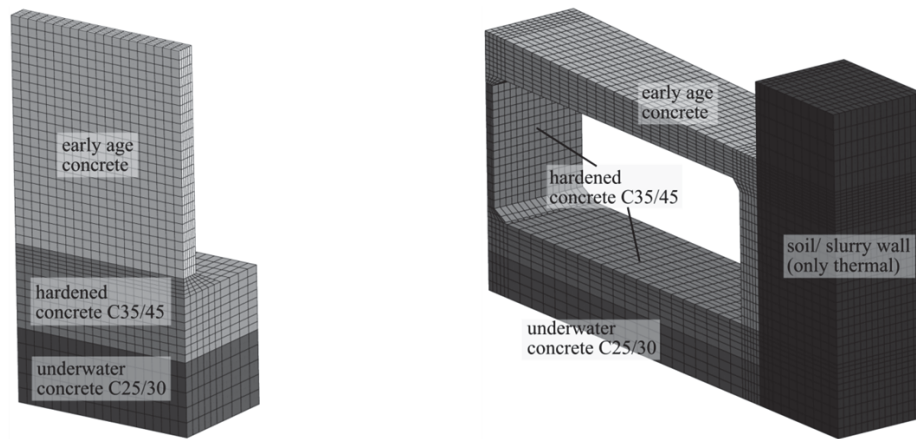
Finite element mesh for the casting of the middle wall (left) and the casting of the outer walls and the ceiling slab (right)
